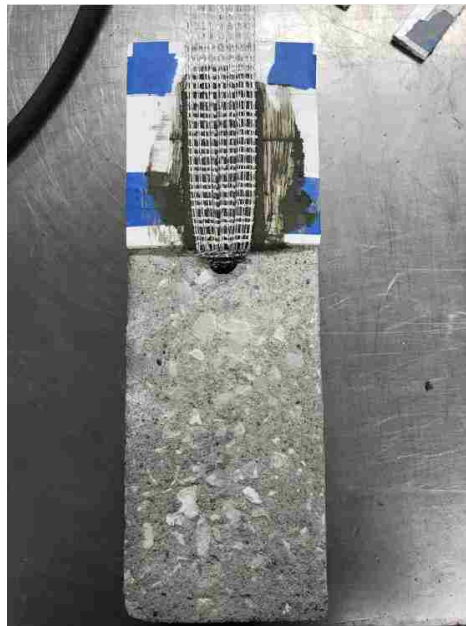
Steel fiber anchor inserted into anchorage hole (100 mm bond length shown, 330 mm bond length similar)
